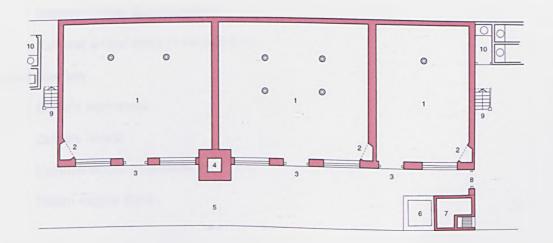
Ground floor plan of Gaunt's wheel, scale 1:200 (author).
